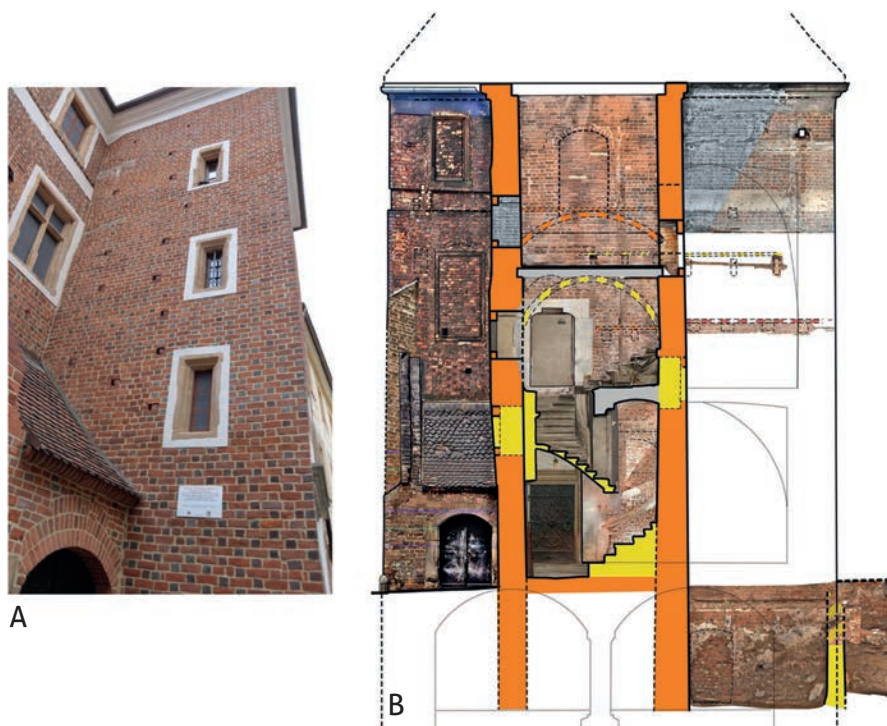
Wrocław, the Chapter House. A – the staircase tower as seen from the west (photo by M. Chorowska); B – the staircase tower, cross-section, overlooking the south wall: 1 – walls from the second half of the 14th century, 2 – walls from the second half of the 15th century, 3 – walls from 1518–1527 (developed by M. Bogdała)
